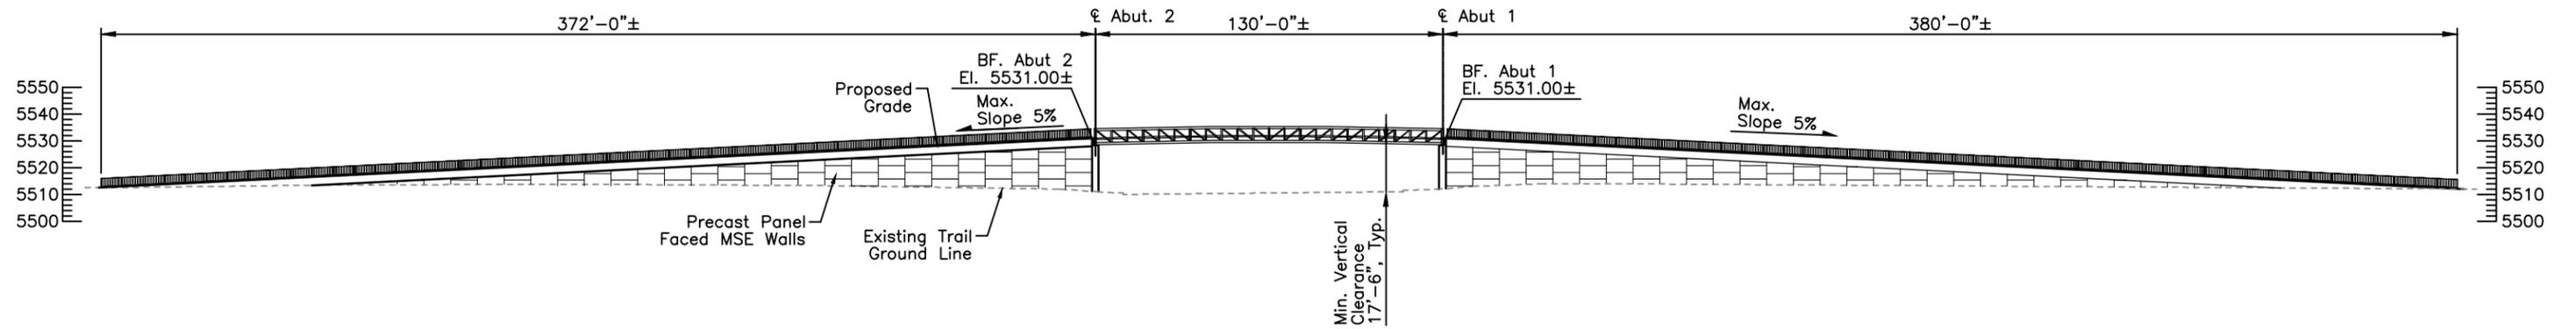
Broadway at Arapahoe Road Crossing Pedestrian Bridge Profile
